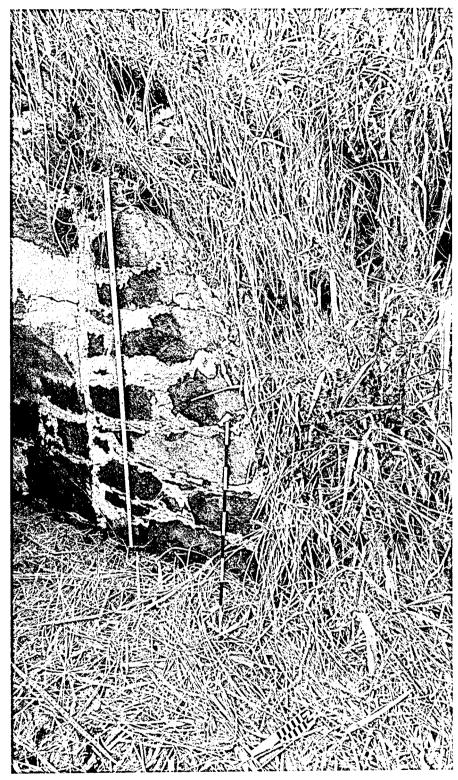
TS-1 Railroad Bridge culvert view to the northwest
